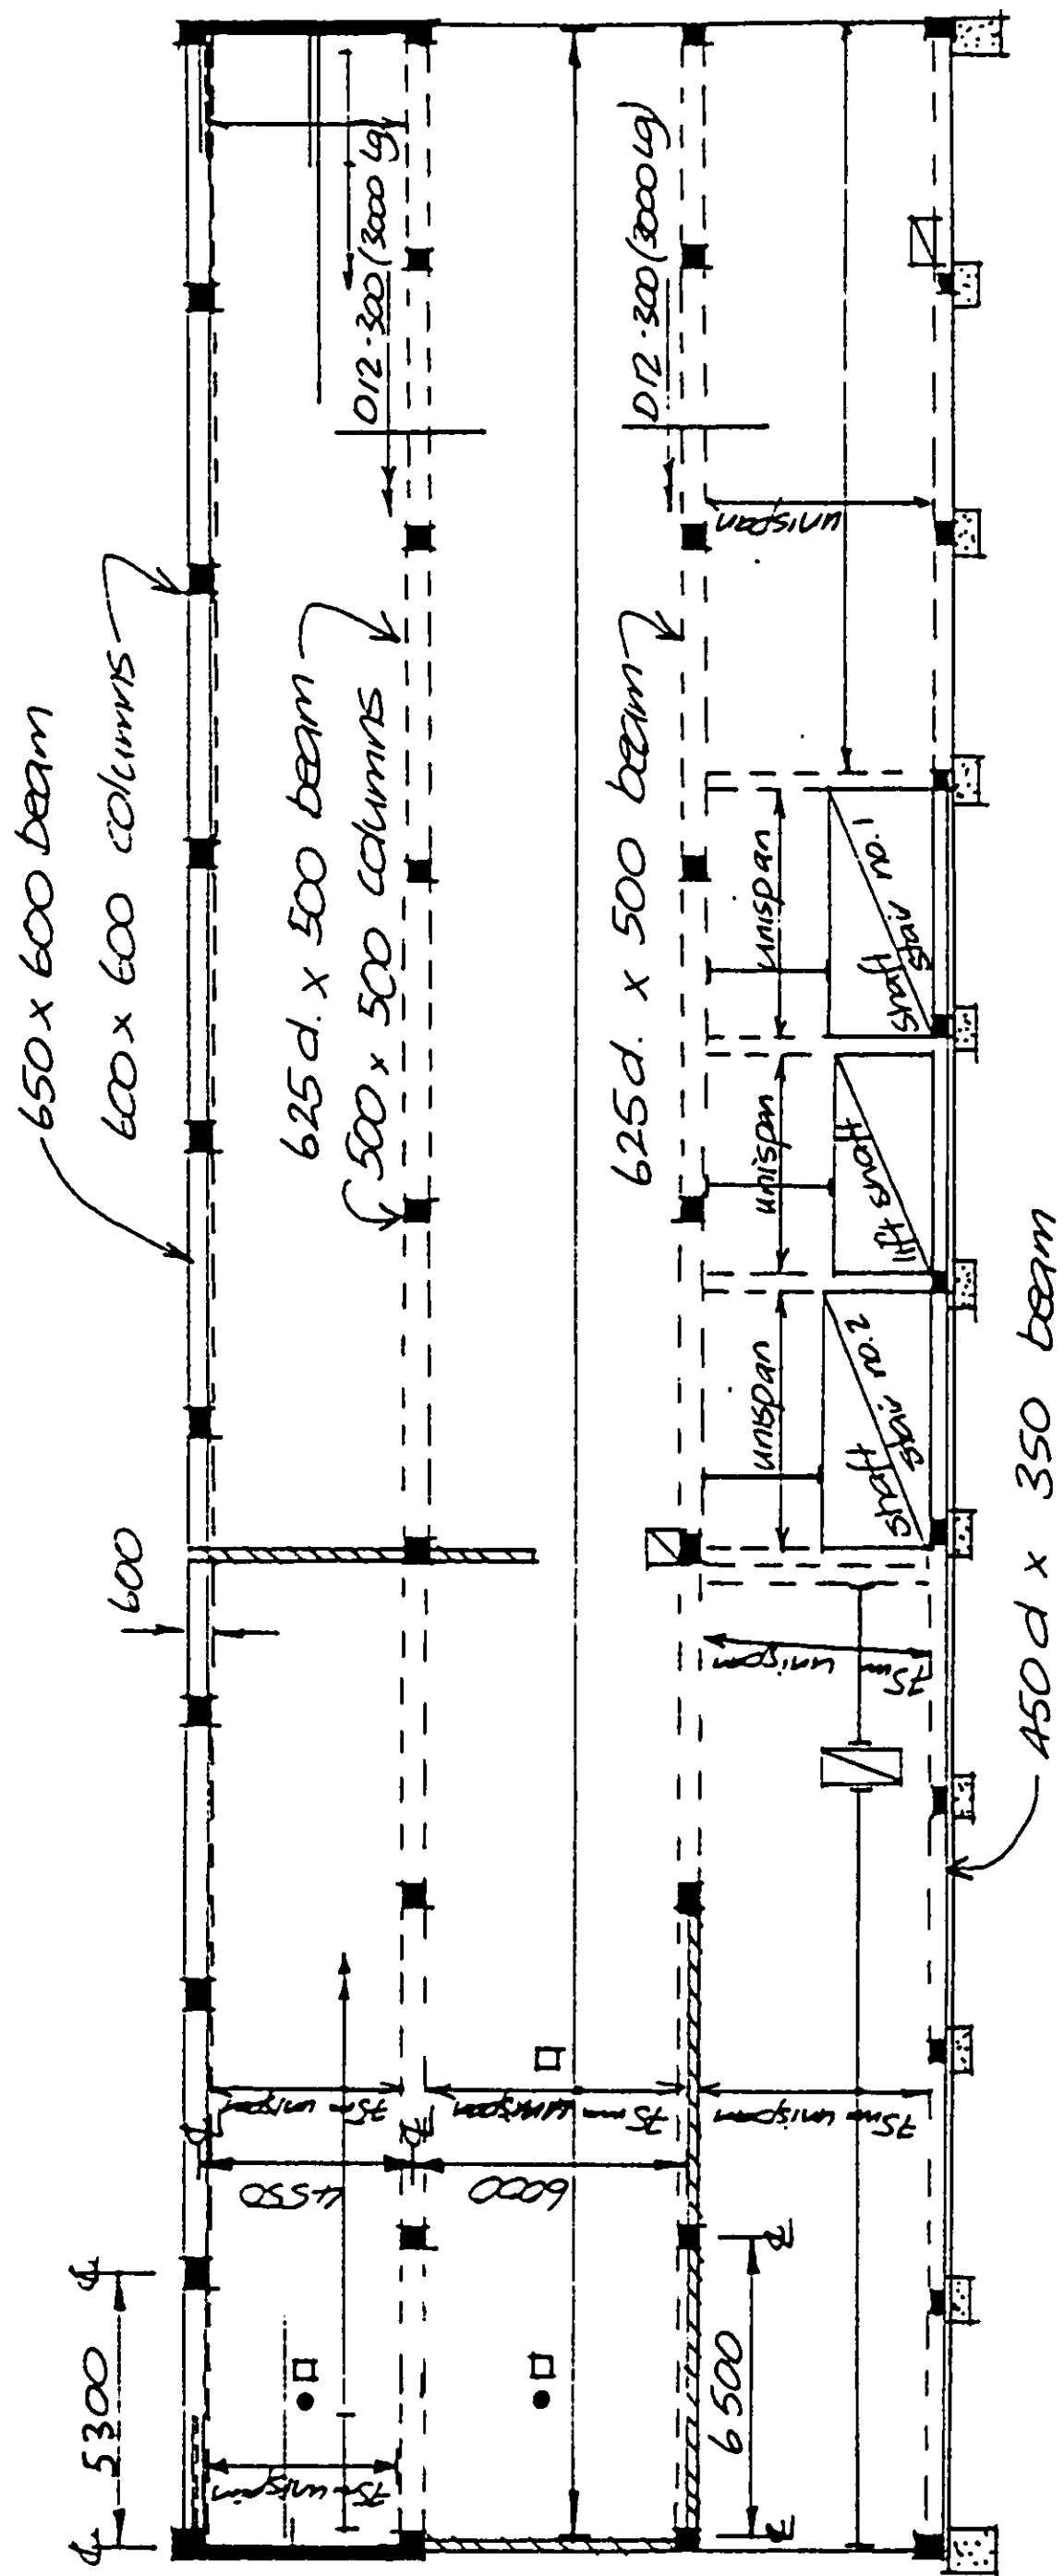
Typical floor plan of one bay of in-situ floor slab
